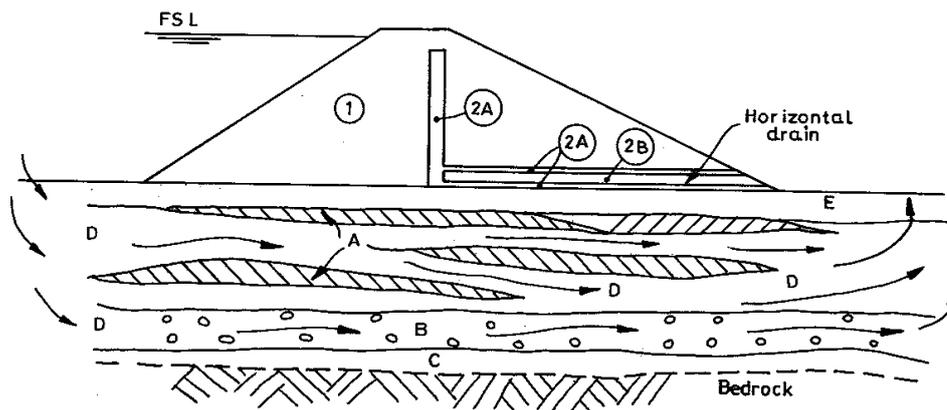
Schematic example of an embankment founded on a stratified alluvial soil where much of the seepage flow will be to an unfiltered exit (Fell et al, 2005)
